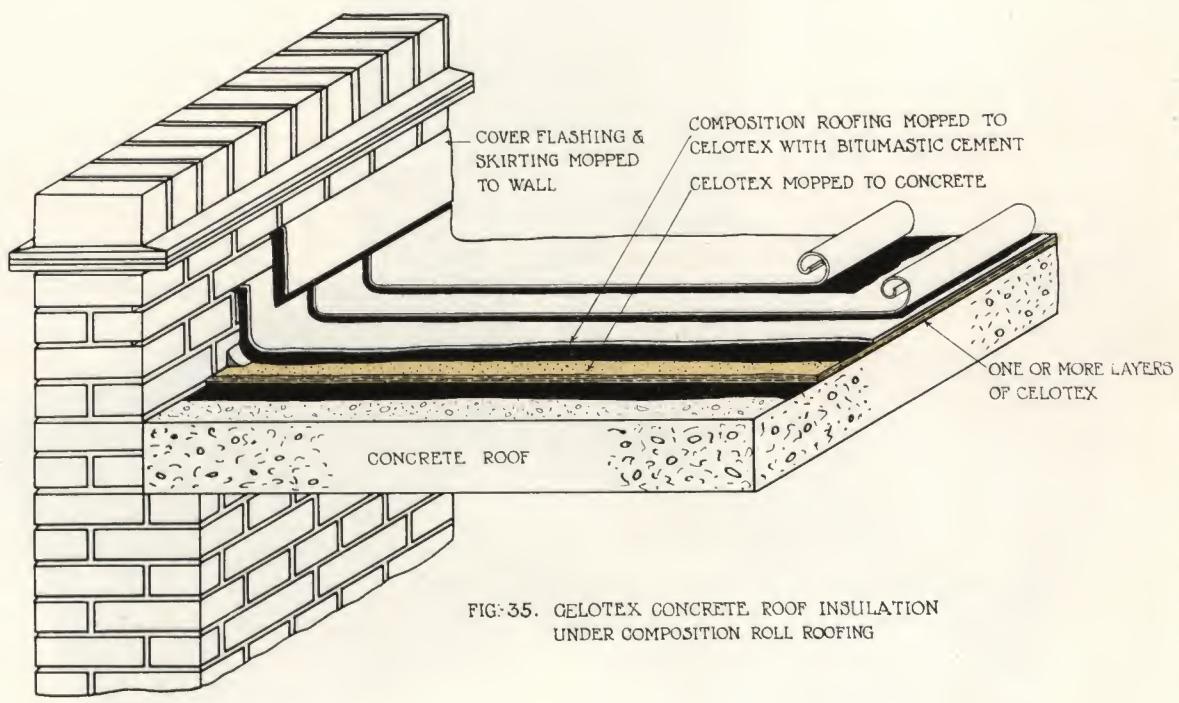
CELOTEX CONCRETE ROOF INSULATION
